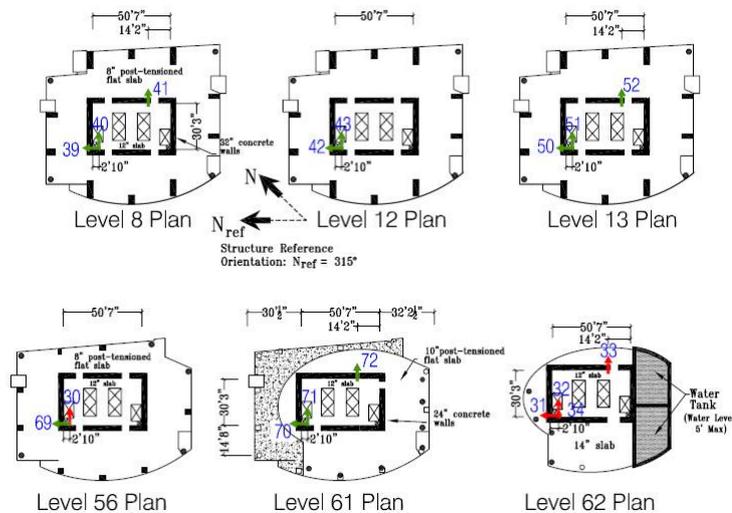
Typical plan views exhibiting sensor locations (green and red arrows), general dimensions and the core shear wall and outrigger columns ([www.stongmotioncenter.org](http://www.stongmotioncenter.org), last visited July 29, 2012). Note the building north reference direction ( $N_{ref}$ ), which is termed NS in this paper. The thickness of core shear wall is 32'' between Level 1 and 32, 28'' between Level 32 and level 55 and 24'' between Level 55 and Level 64 (Roof).
